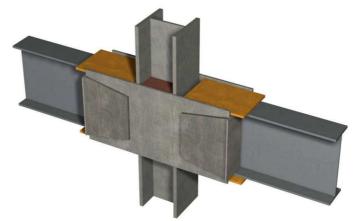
SidePlate[™] retrofit connection [Crawford, 2002]
